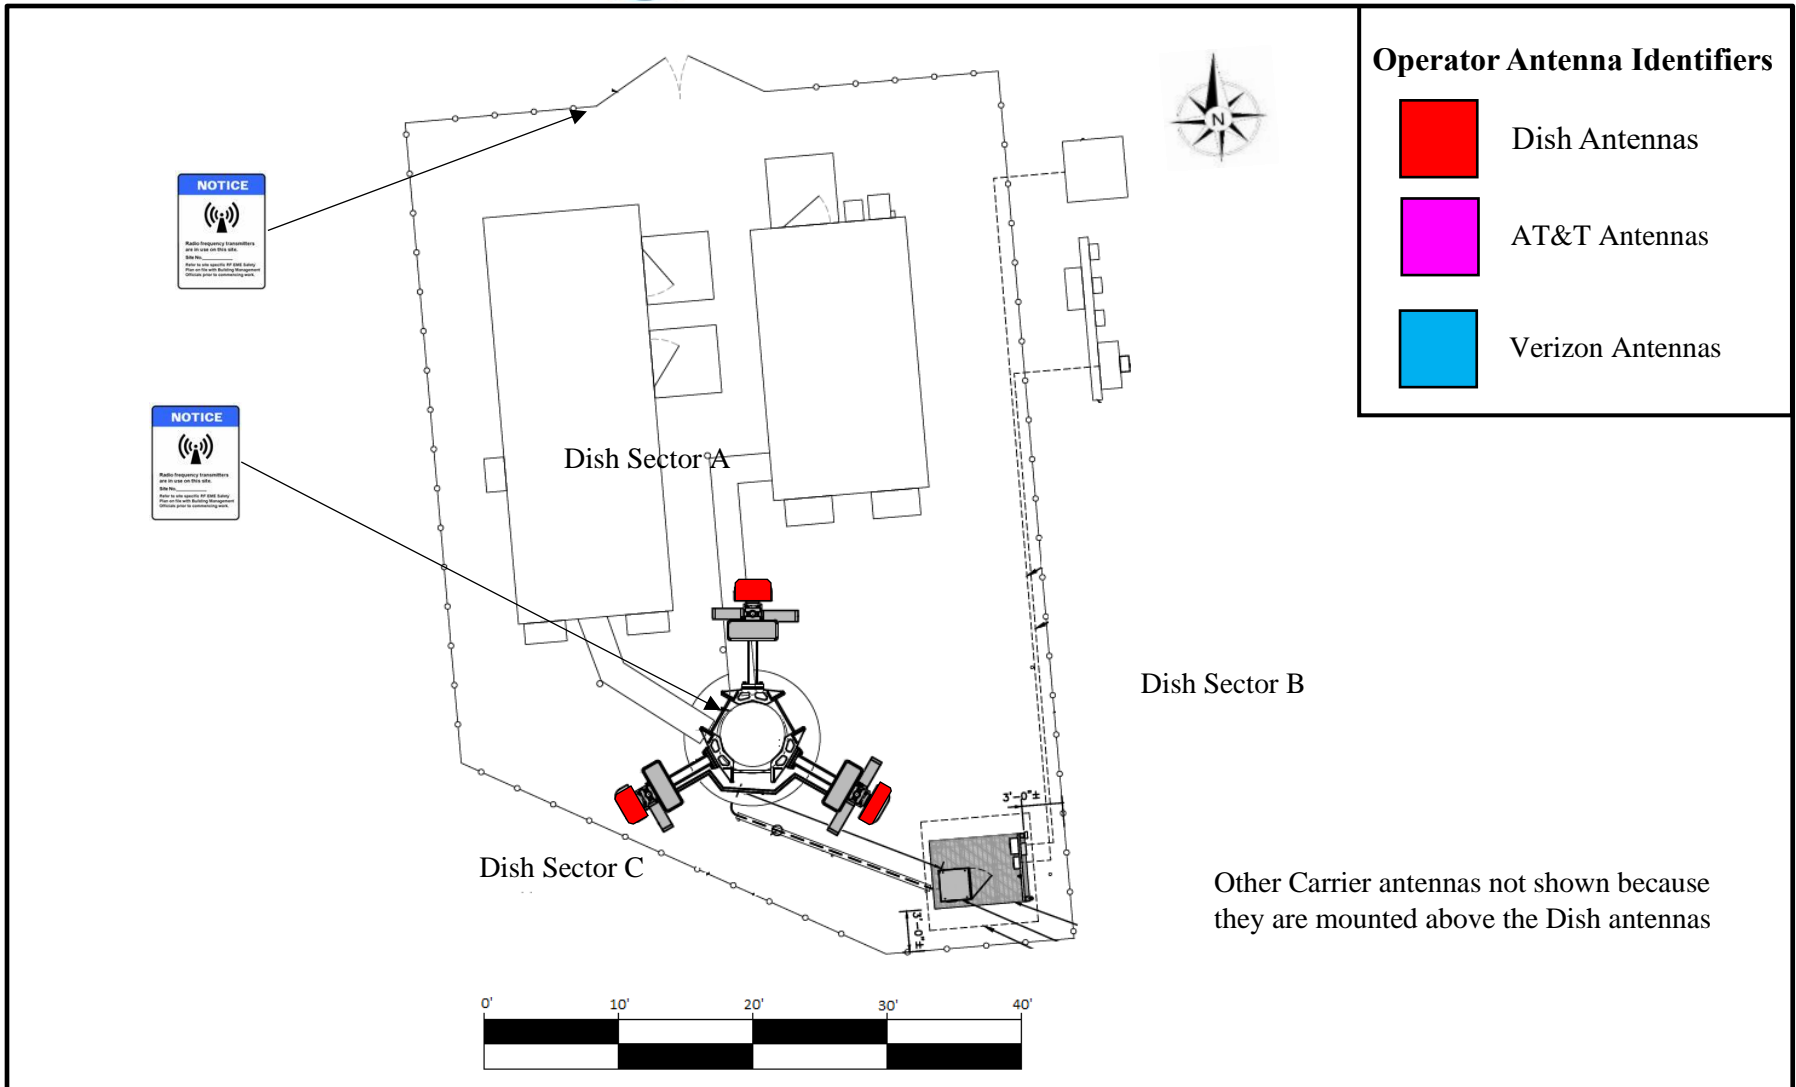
SIGNAGE RECOMMENDATION PLAN
